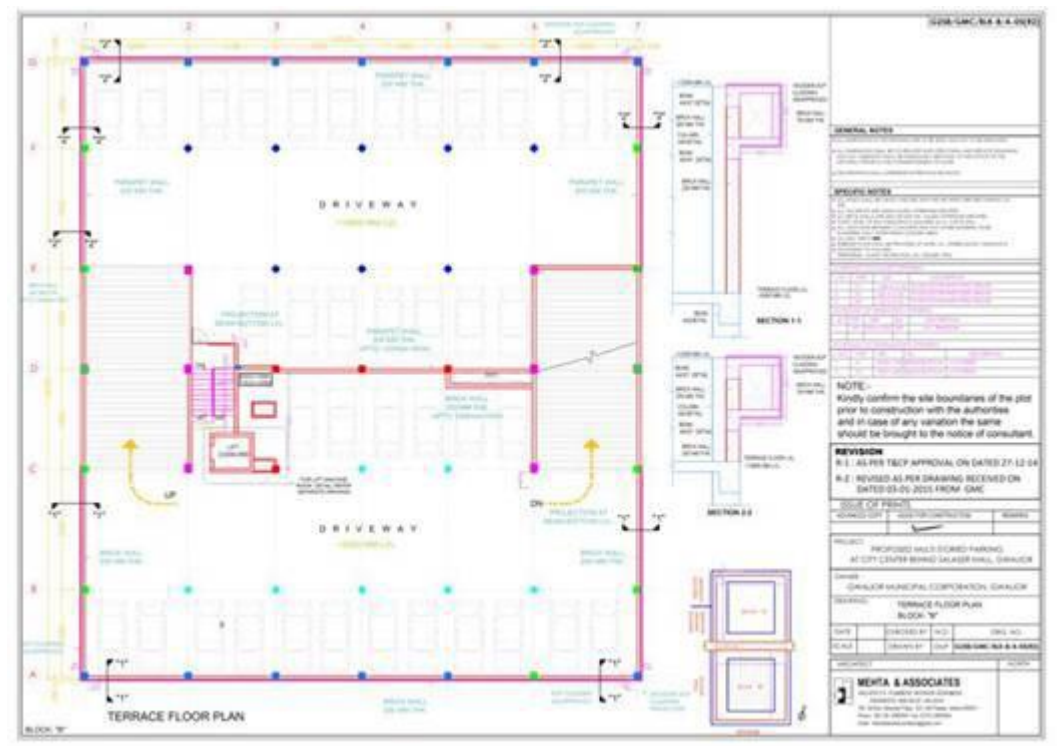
Parking Location: Salasar Multi LevelParking (Terrace Floor-Block B)
